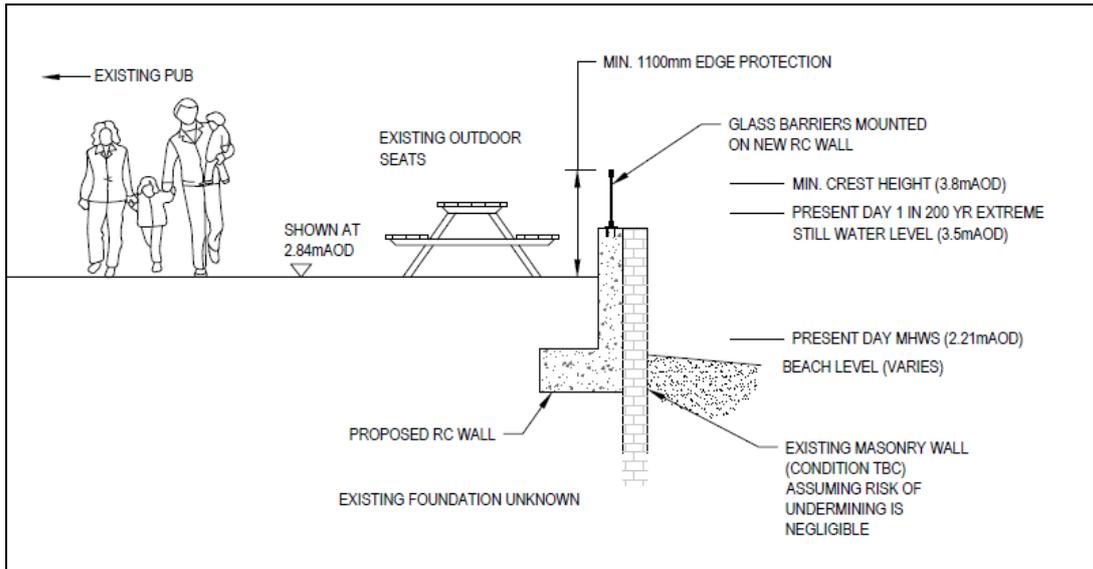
Sketch of indicative glass topped floodwall cross section for ODUs 3d-3e (not to scale)
